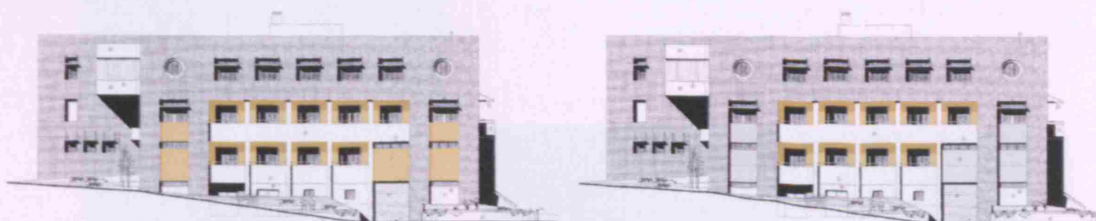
South Elevations indicating TAPs in initial design and in constructed building
